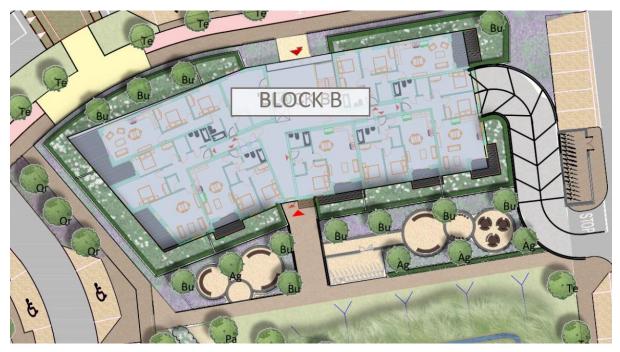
16: Extract from Park Hood Landscape Plan (drawing no. 6473-L-304)
